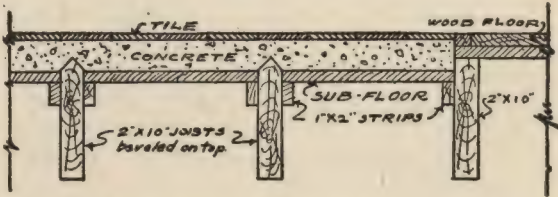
Detail Section of Art or Mosaic Tile Floor.
